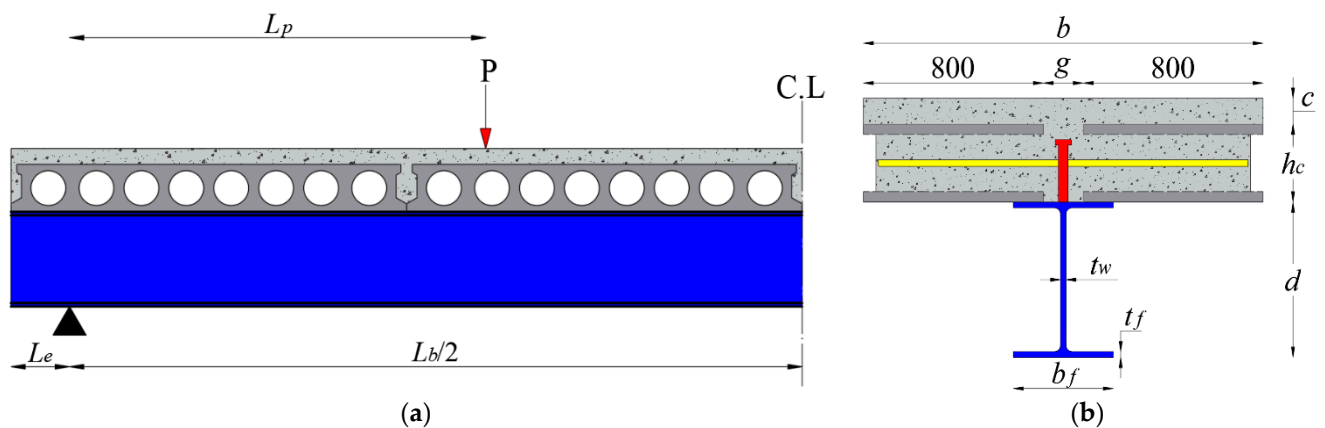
Geometric details of tests (in mm): (a) lateral view; (b) section.
